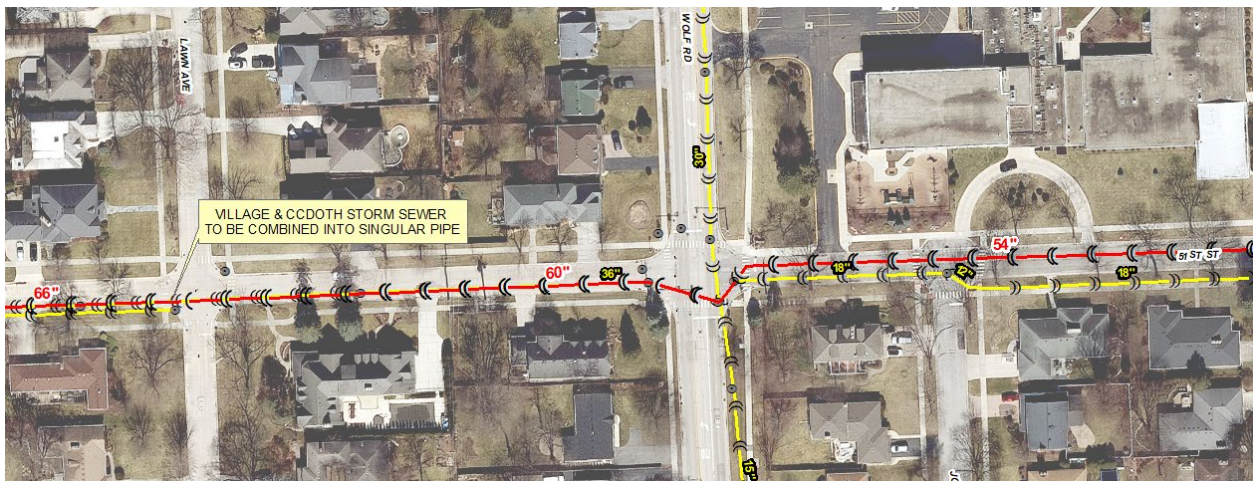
New Storm Sewer and Combining of Village & CCDOTH Storm Sewer on 51st Street
